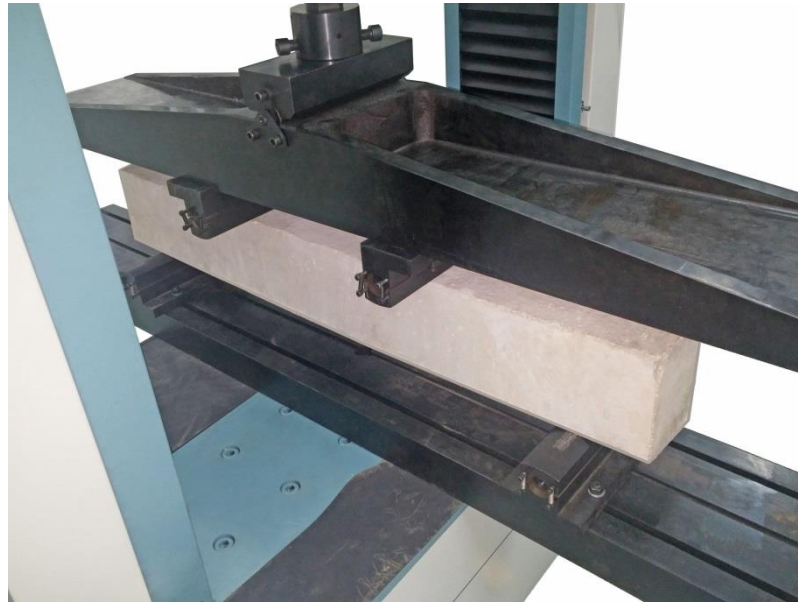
Universal Testing Machine (300 kN) with the beam testing setup.
